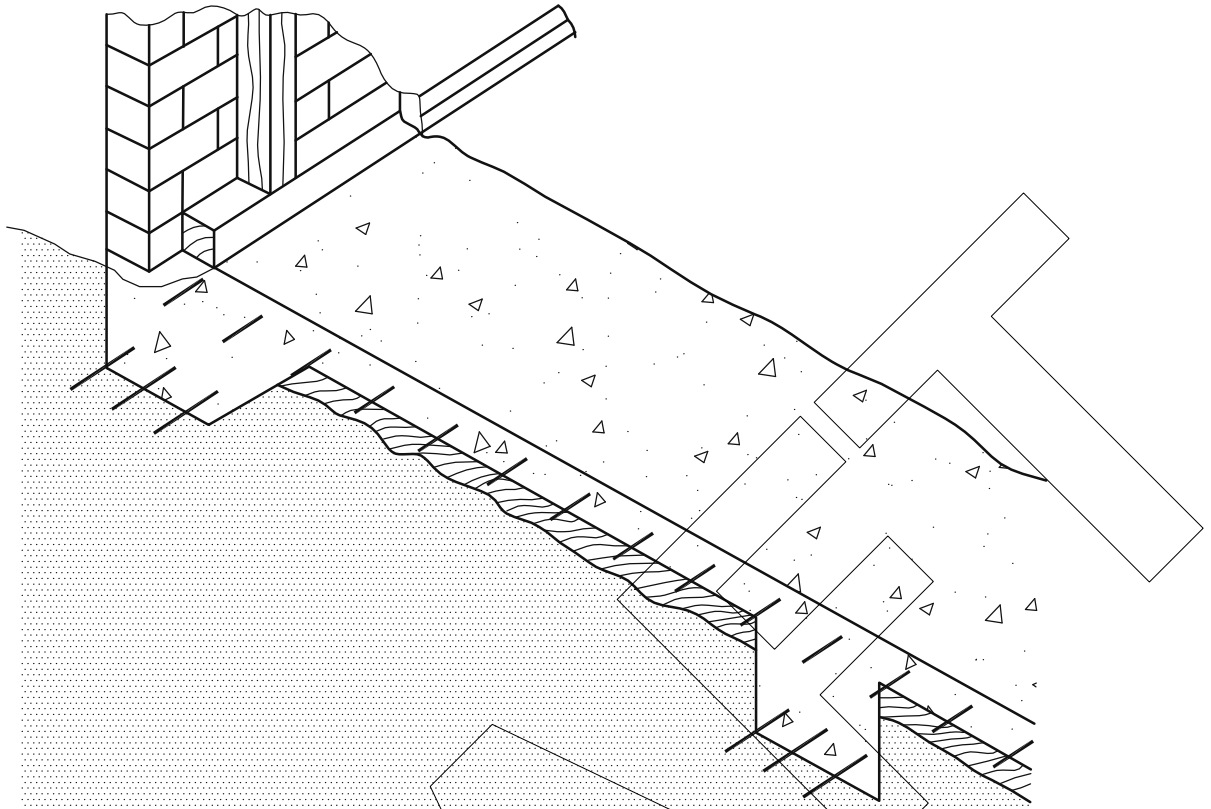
STIFFENED RAFT CONSTRUCTION
